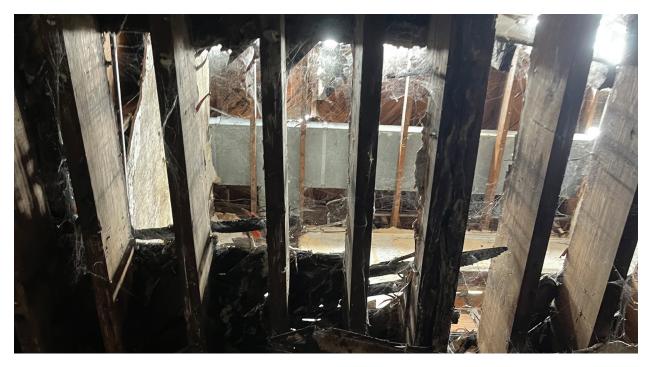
View of second floor framing and open roofing above from ground floor interior, TEF Design, 2024.
